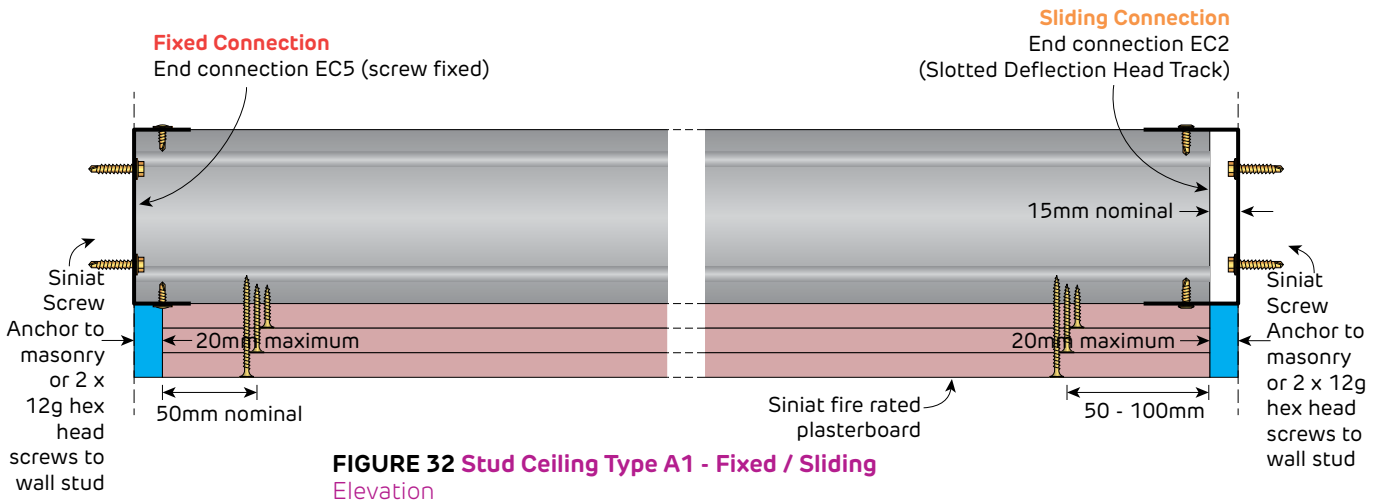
Stud Ceiling Type A1 - Fixed / Sliding
